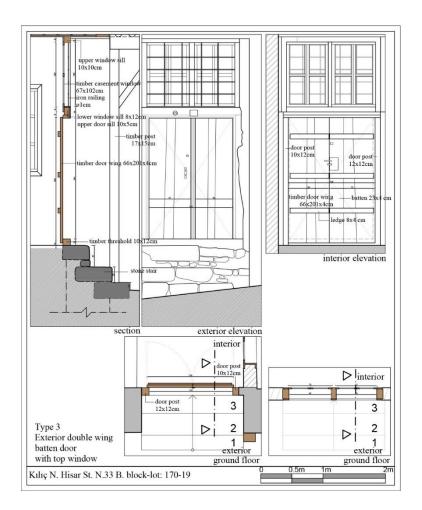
Drawing of exterior double wing batten door with top window located on stone masonry wall, Type 3 (Kılıç N. b. block-lot: 170-19)
